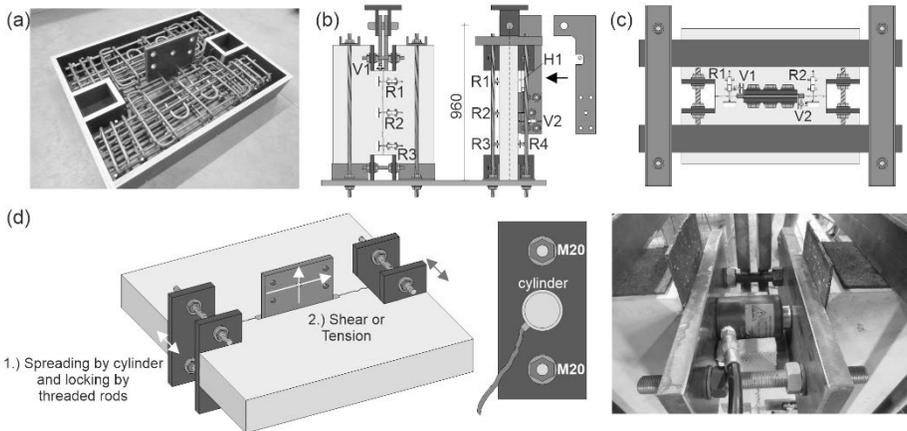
Small-size tests with longitudinally cracked concrete; a) formwork and reinforcement of the test specimens with recesses; b) setup of the shear- or c) tensile-tests; d) crack initiation: bracing of the test specimen halves by spreading plates with the help of hand cylinders and threaded rods.
